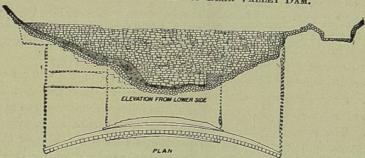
Plan and Elevation of Bear Valley Dam.
